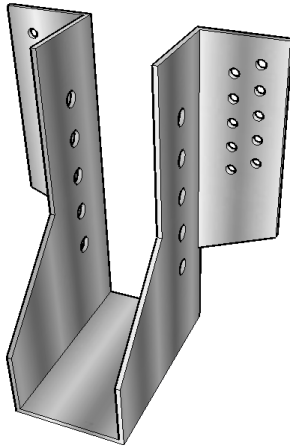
A beam shoe used to connect a timber beam to a wall or a column.
